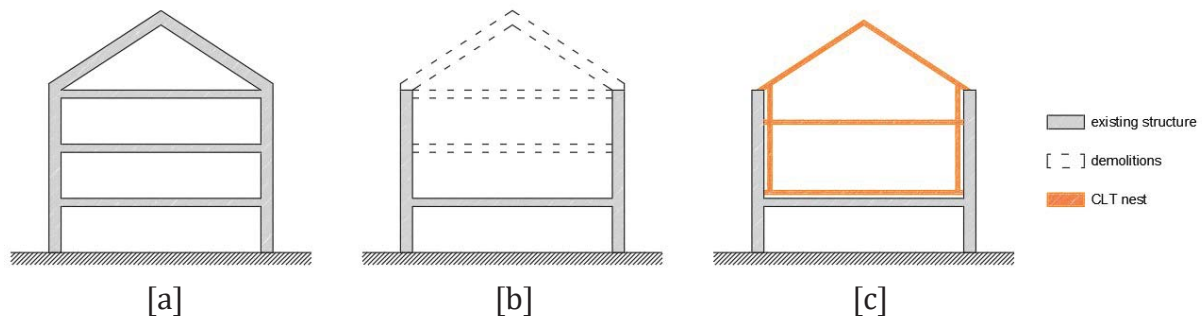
Intervention scheme: a) existing structure, b) demolished parts, c) new CLT nesting structure.
